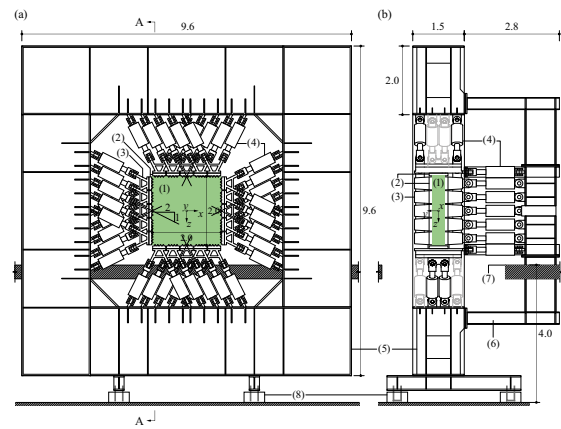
Overview of the LUSET: (a) elevation; (b) section A-A (dimensions in m); adopted from [1].
